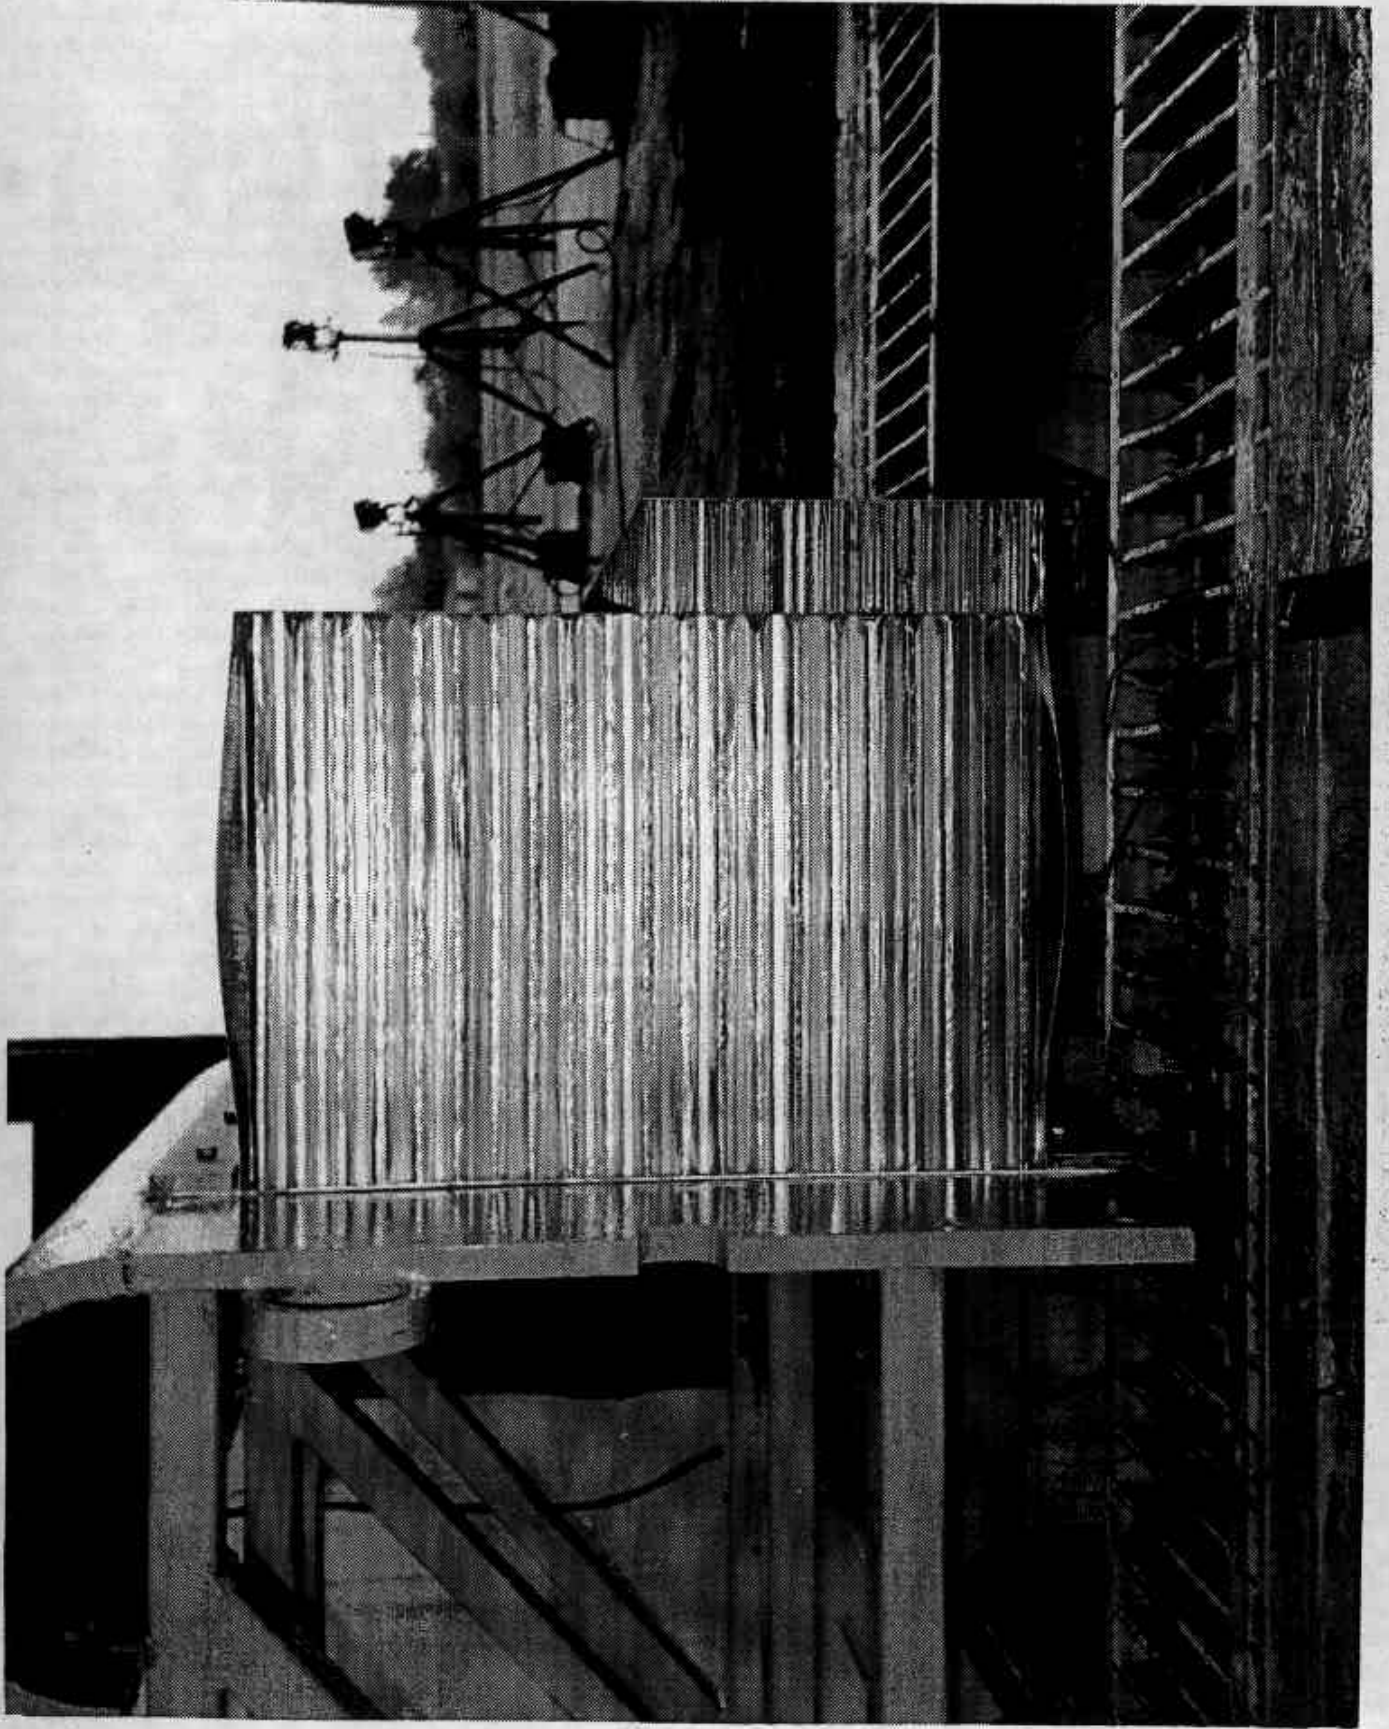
PRE-TEST BARRIER RIGHT SIDE VIEW
